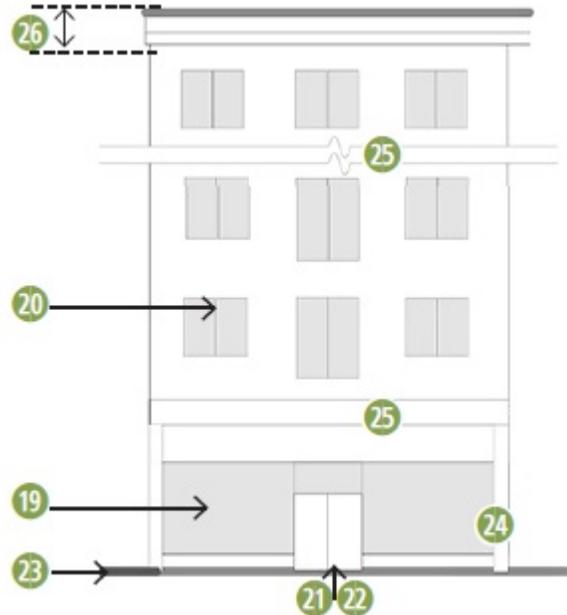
D. Downtown Storefront: Facade Requirements
